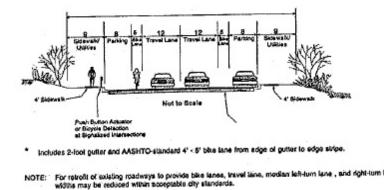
MINOR ARTERIAL AND COLLECTOR ROADWAY TYPICAL CROSS SECTIONS DIVIDED ROADWAY WITH BIKE LANES
